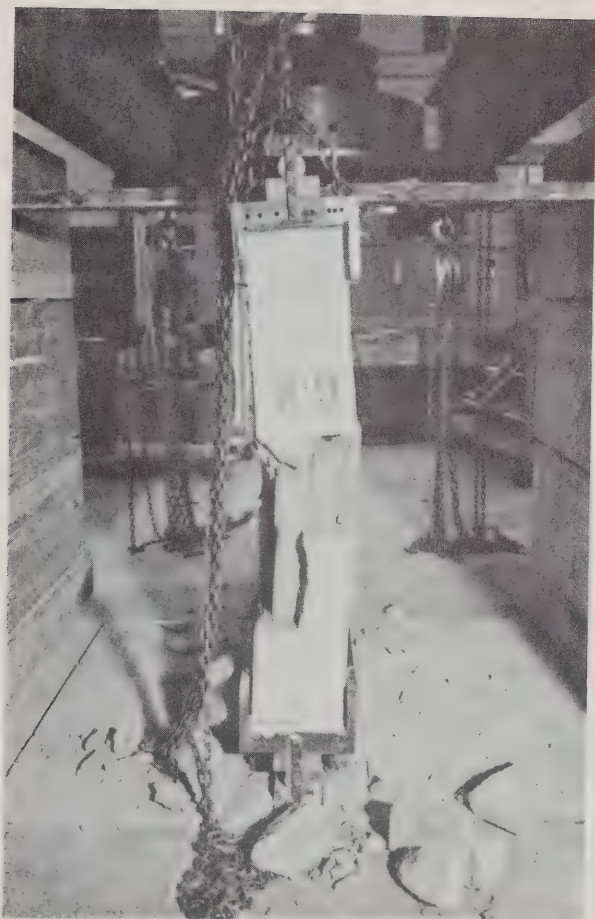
Failure of Short Wall Specimen with 3-#9
